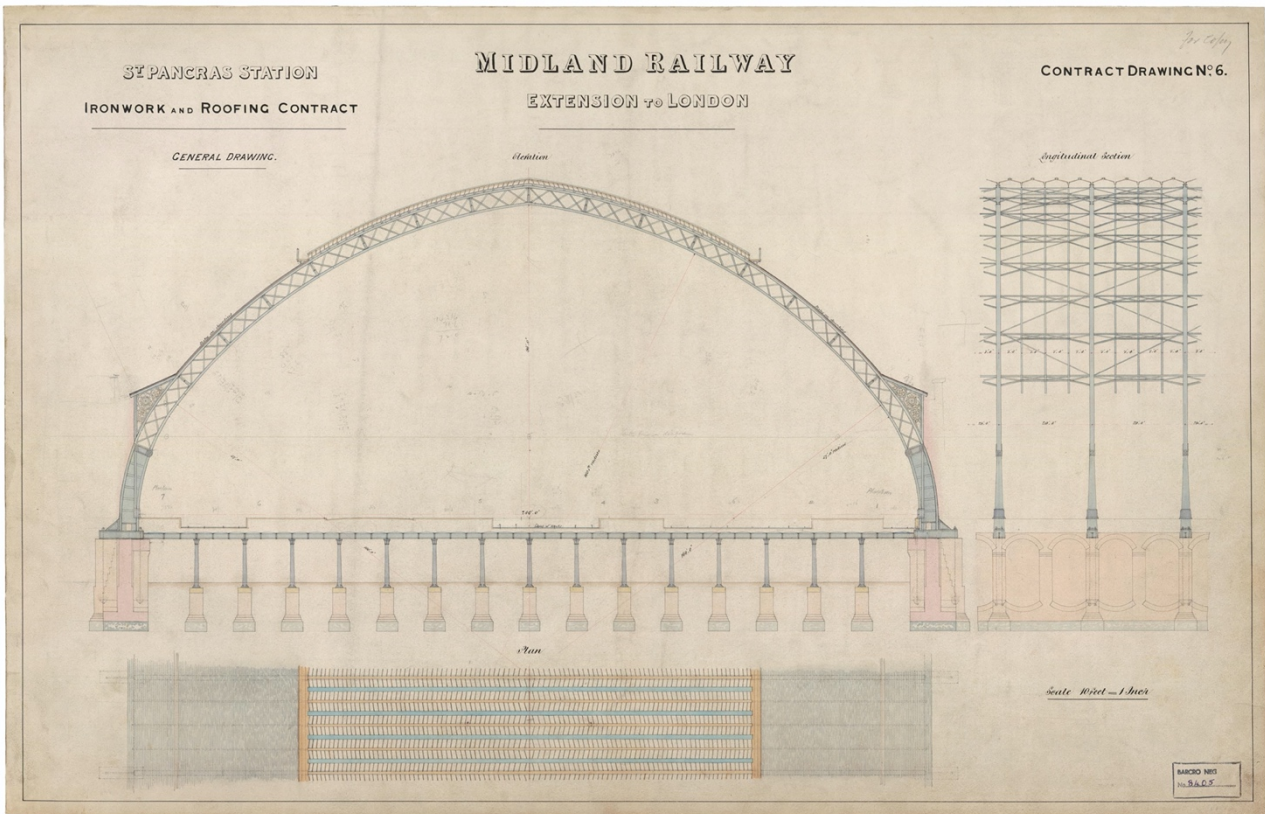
Section drawing of the St. Pancras Train Shed trussed arch roof (Barlow, 1868)
